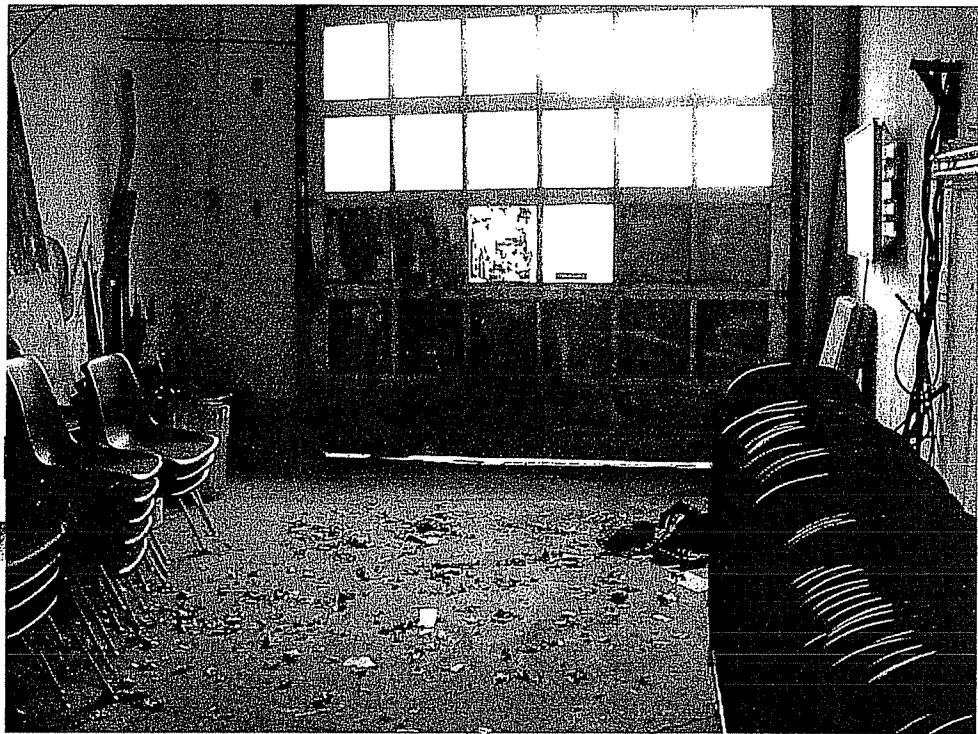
Interior of former "Bill's Key Shop" garage bay, facing west.
